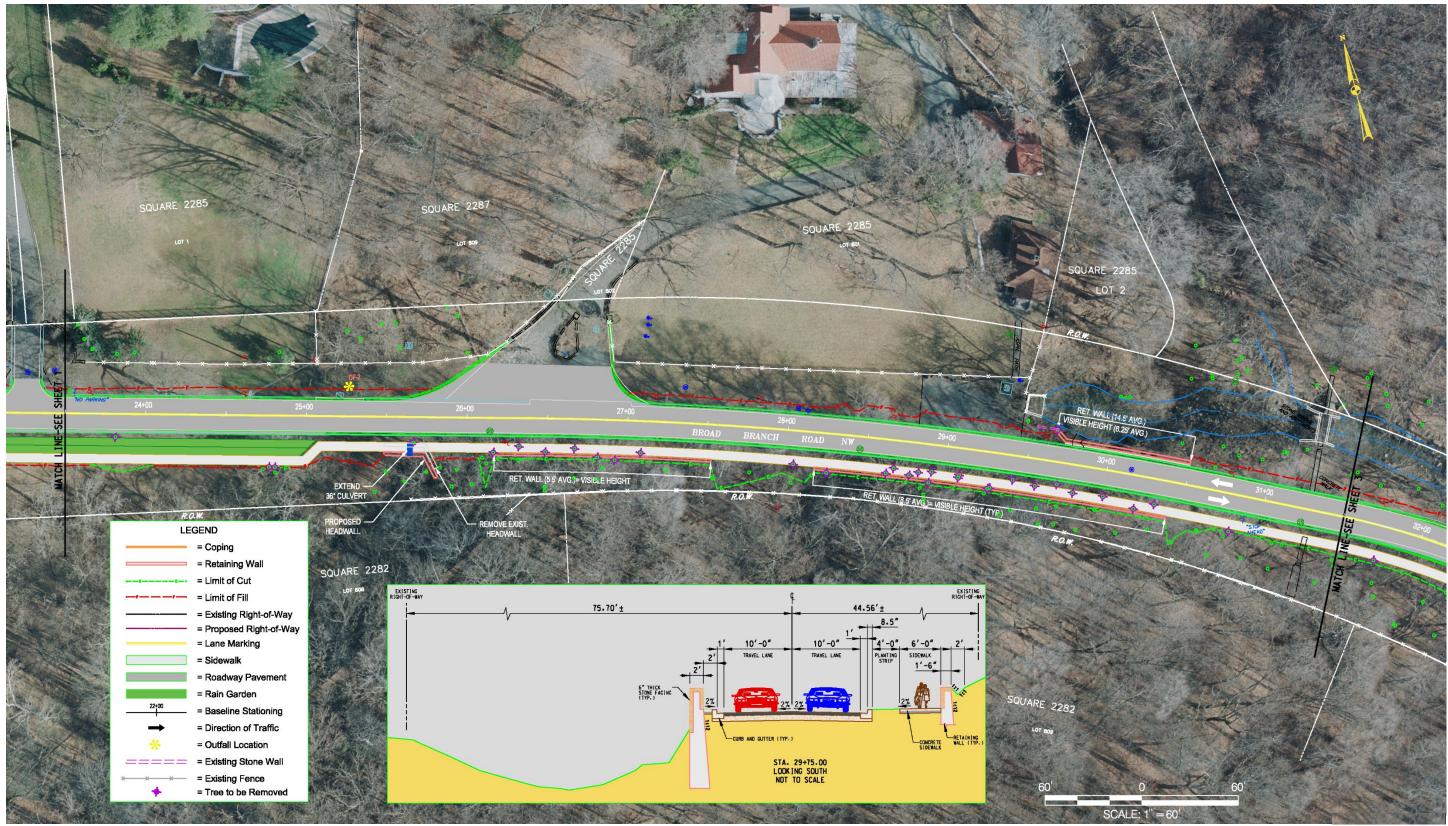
Alternative 3 Modified (Sheet 2 of 9)
